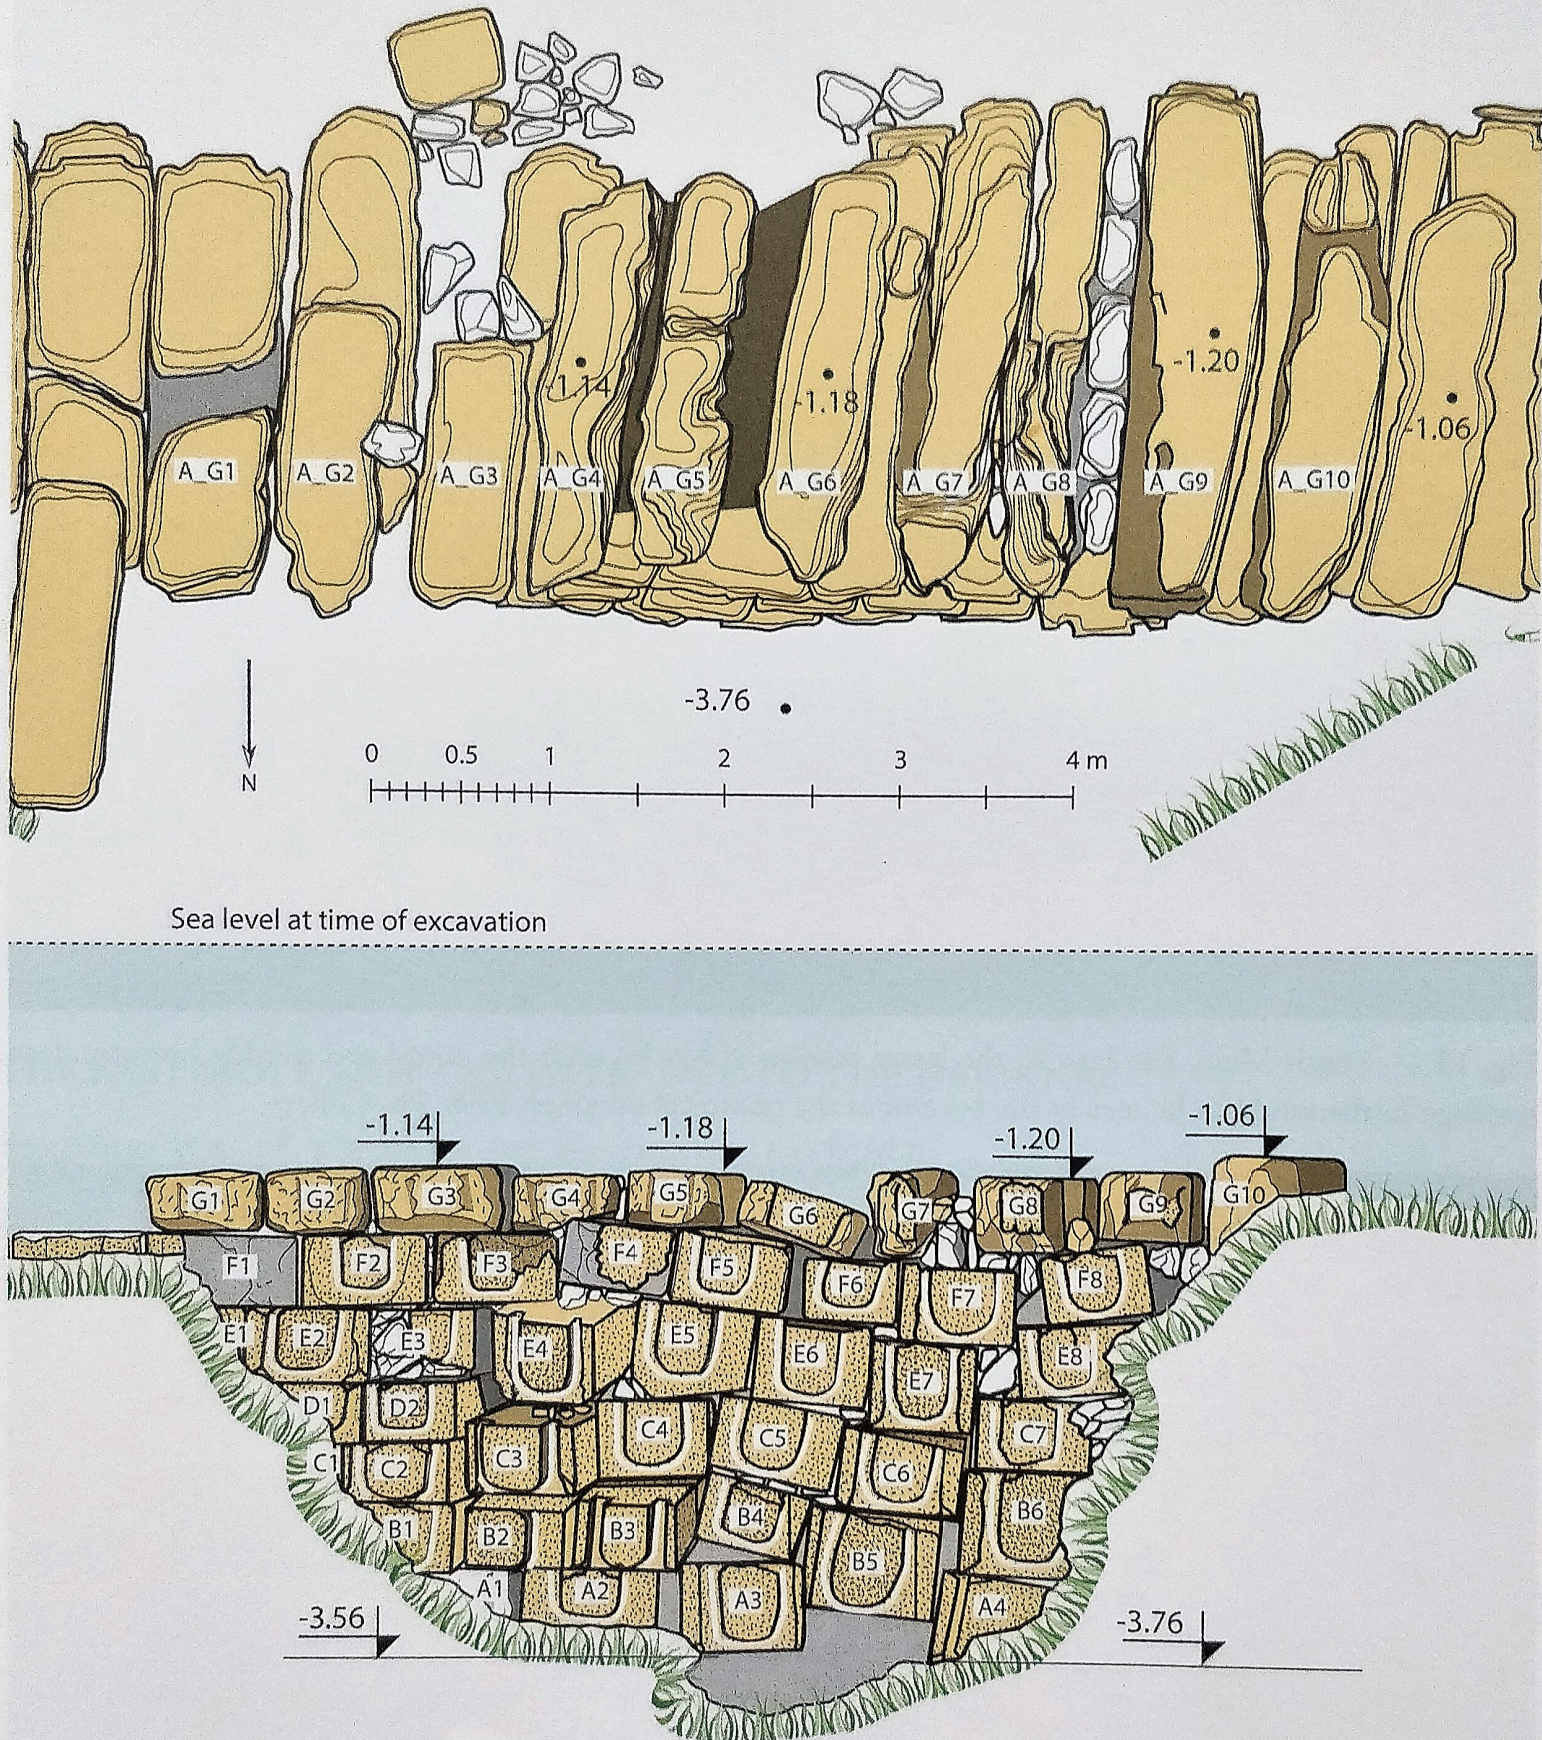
South Mole, Sondage A, plan and section with numbered blocks (drawing and CAD EFA, T. Koželj)
